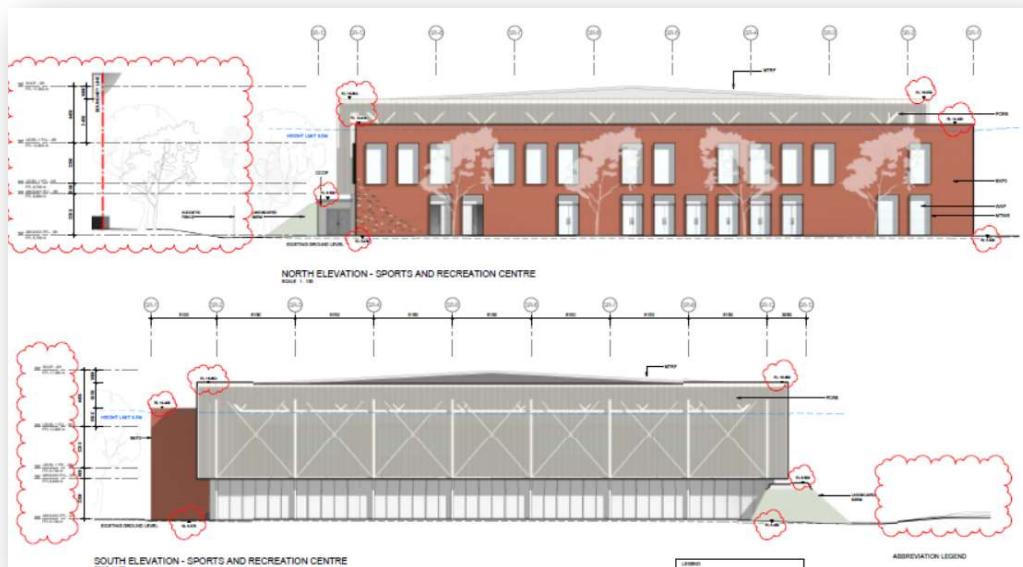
Extract from Elevations Plan (Drawing DA-SR-30-01) showing the north and south elevations of the Sports and Recreation Centre (Source: Cox Architecture 2023)
